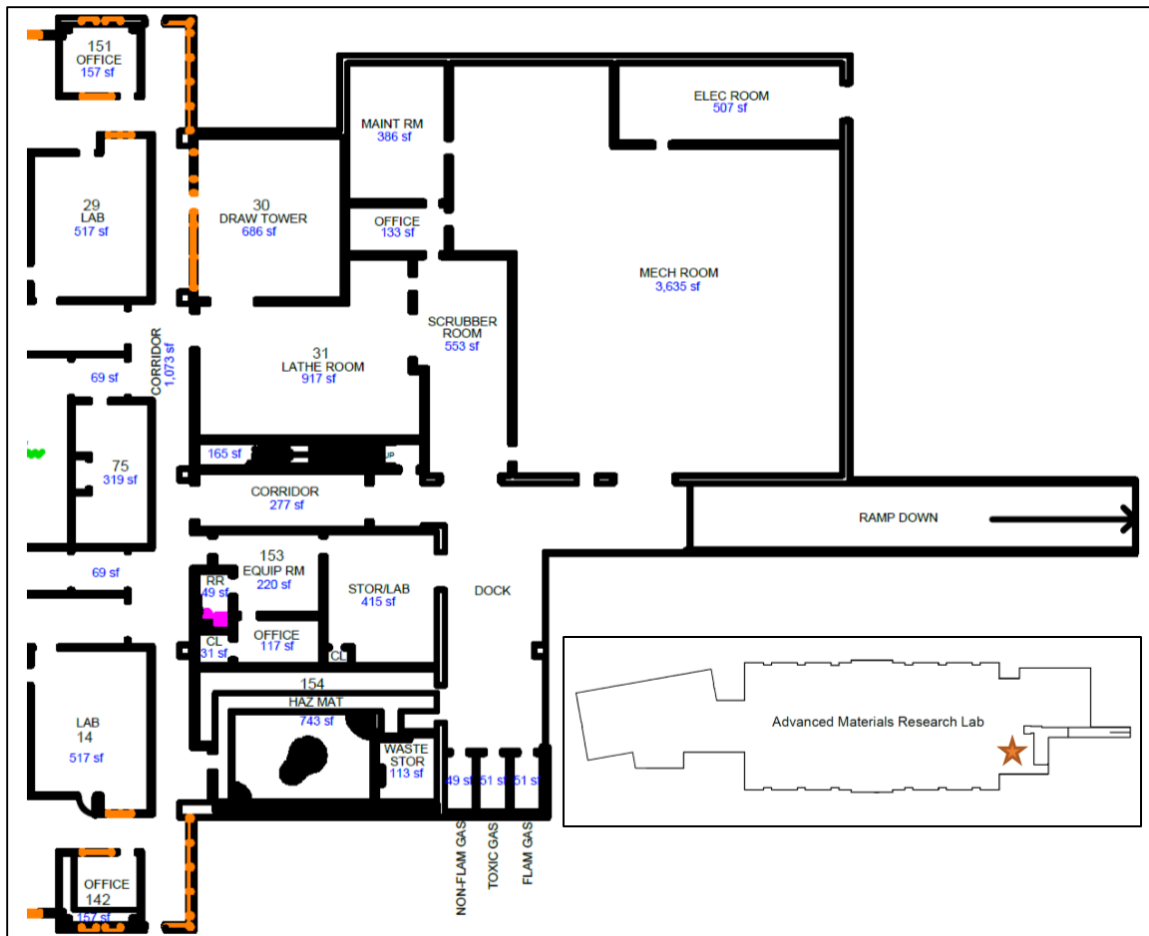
Distribution floor plan for the AMRL building section highlighted on the overall outline shown in the bottom right corner of the figure [Drawing provided by Clemson Facilities].
